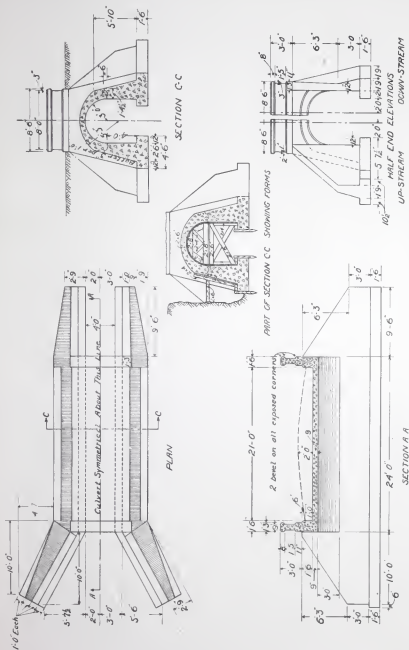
Plan for a Plain Concrete Arch Culvert. U. S. Department of Agriculture, Office of Public Roads. Span 6 feet. Span 6 feet. *PLAN FOR A PLAIN CONCRETE ARCH CULVERT
